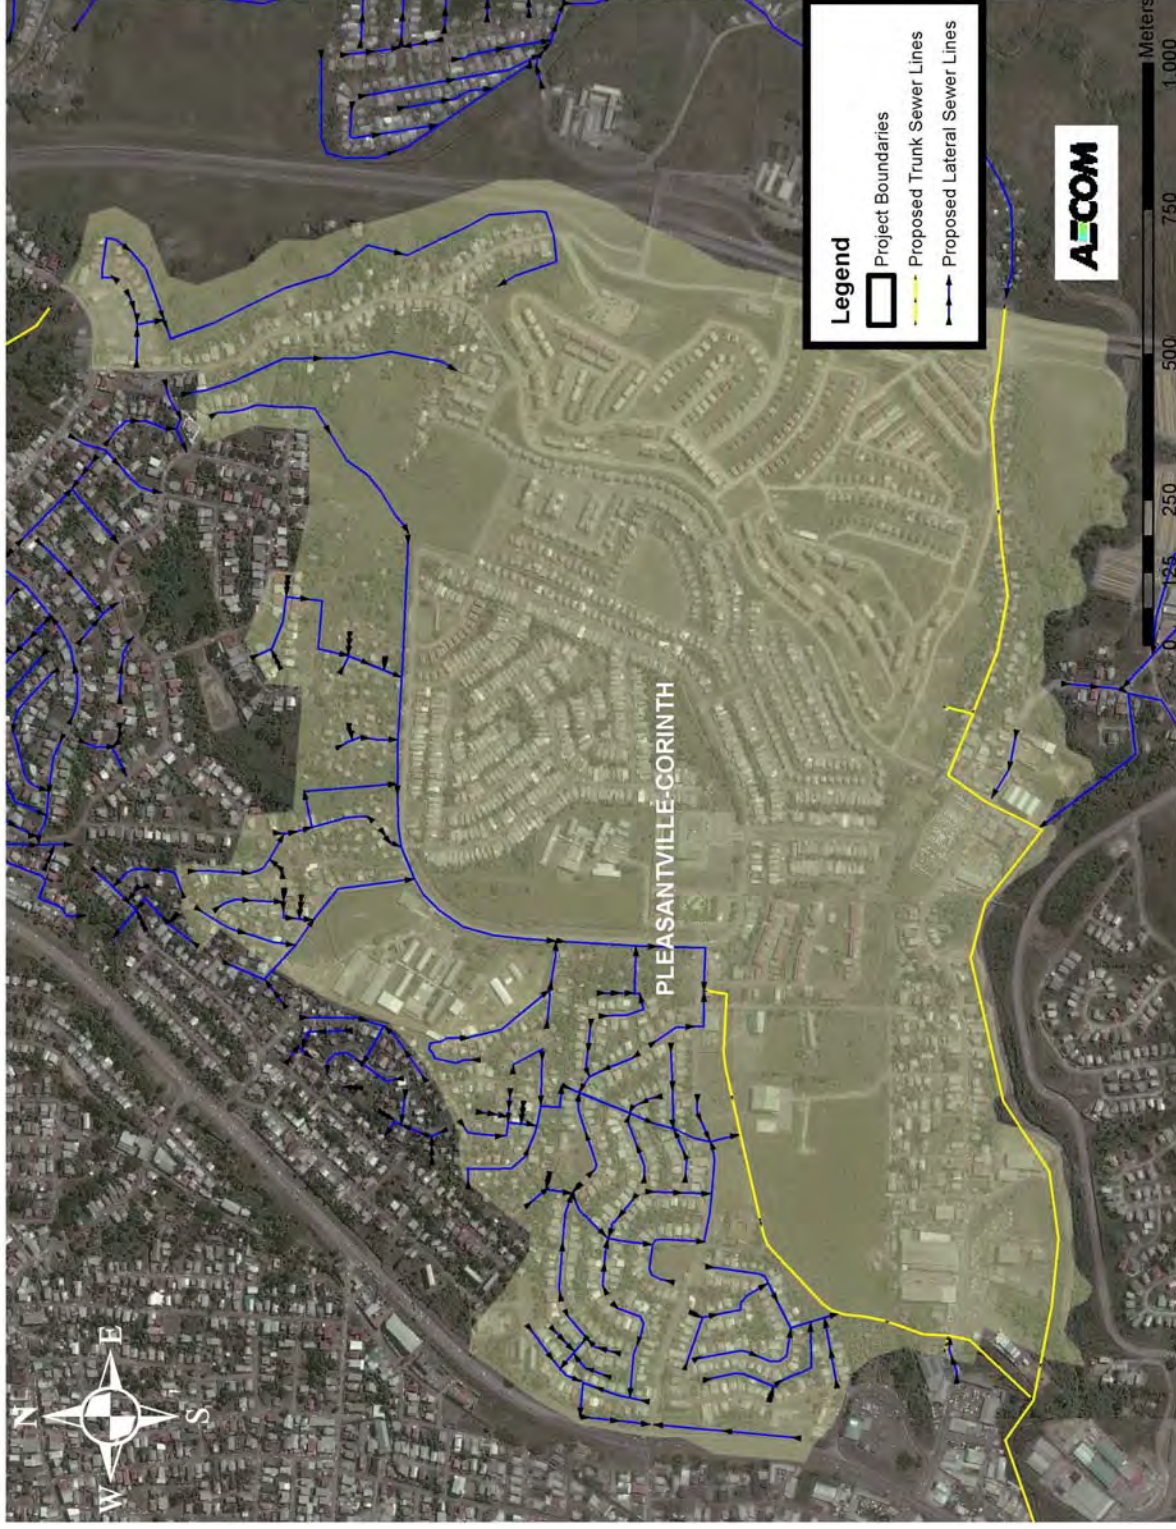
Pleasantville-Corinth Subcatchment New Sewer Layout
